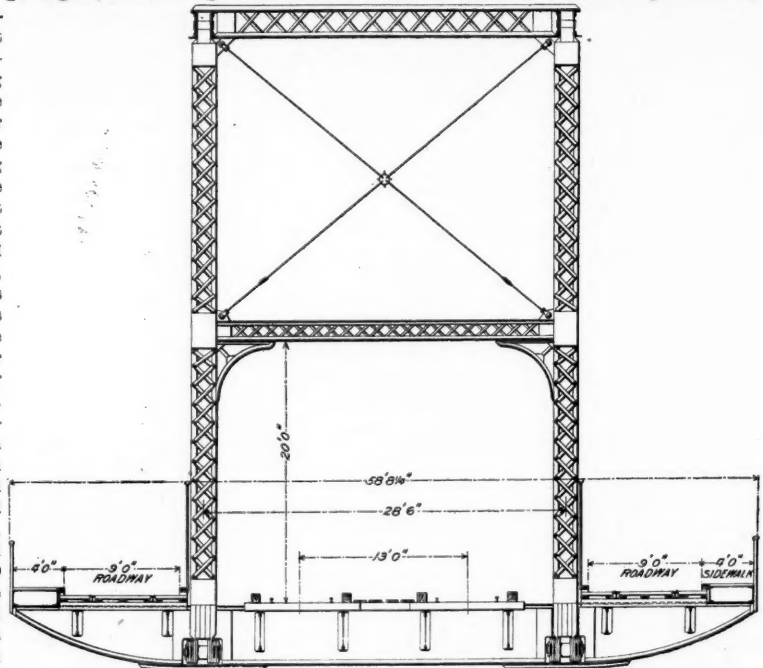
General Cross-Section of Duluth-Superior Bridge.
